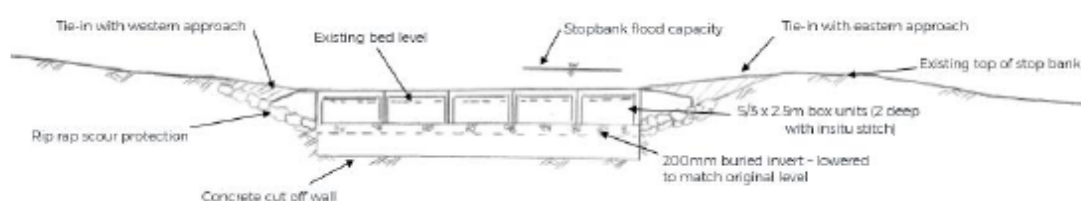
Sketch Long Section on crossing showing indicative Multi Cell Box Culvert
